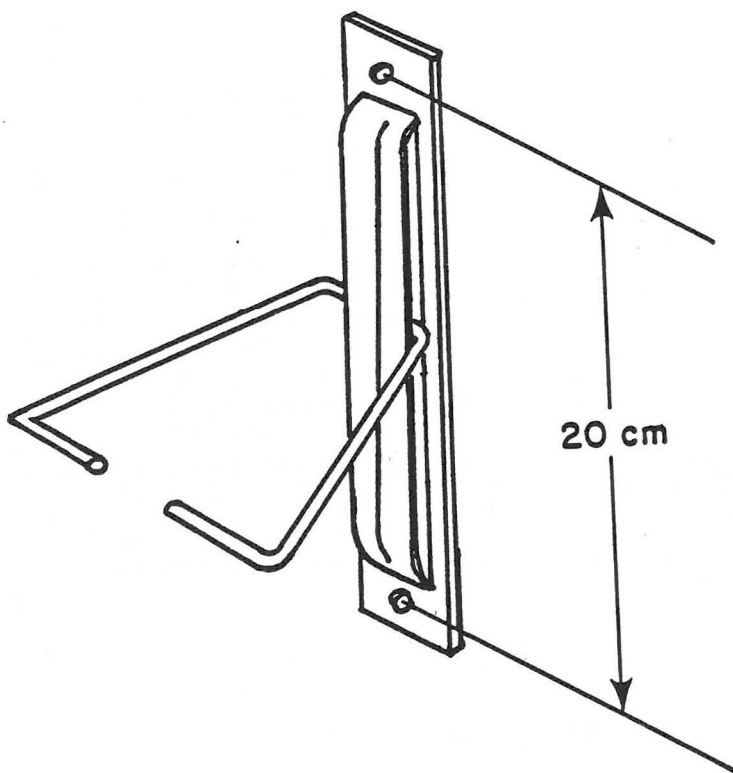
Adjustable Wall Tie Used in Full-Scale Lateral Load Tests
